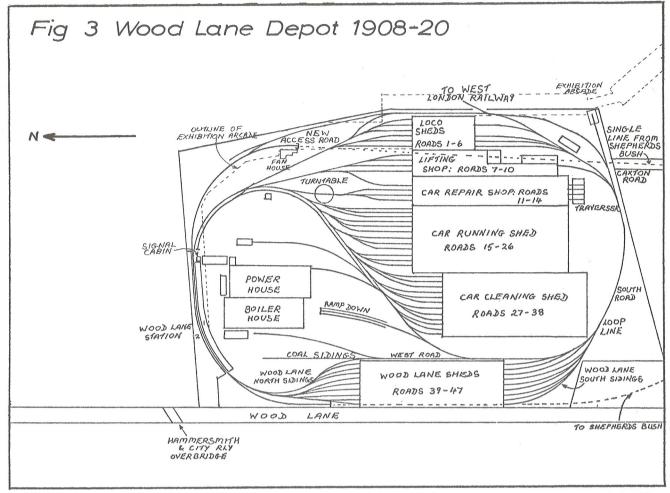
Depot with Wood Lane Station, Terminal Loop, Wood Lane North Sidings and Exhibition Arcade, 1908. The Station, with two platforms built either side of a single track, was built at a lower level than the original depot entrance road and there was now a slope up towards the sheds. Another connection, the 'West Road', was built to connect the west end of the new station with the depot loop road. Trains could now enter the depot from either end of the platform. Another set of connections was also put in at this time to give access to Wood Lane Sheds from the west end of the platforms. This was known as the Wood Lane North Sidings. The turntable was also added at this time. Note the Exhibition arcade covering the east and north side of the site, and the new position of the signal cabin. Also a new access road was laid from the eastern side of the depot loop road to the new platforms. This line joined the line from Shepherds Bush just north of the tunnel entrance.
